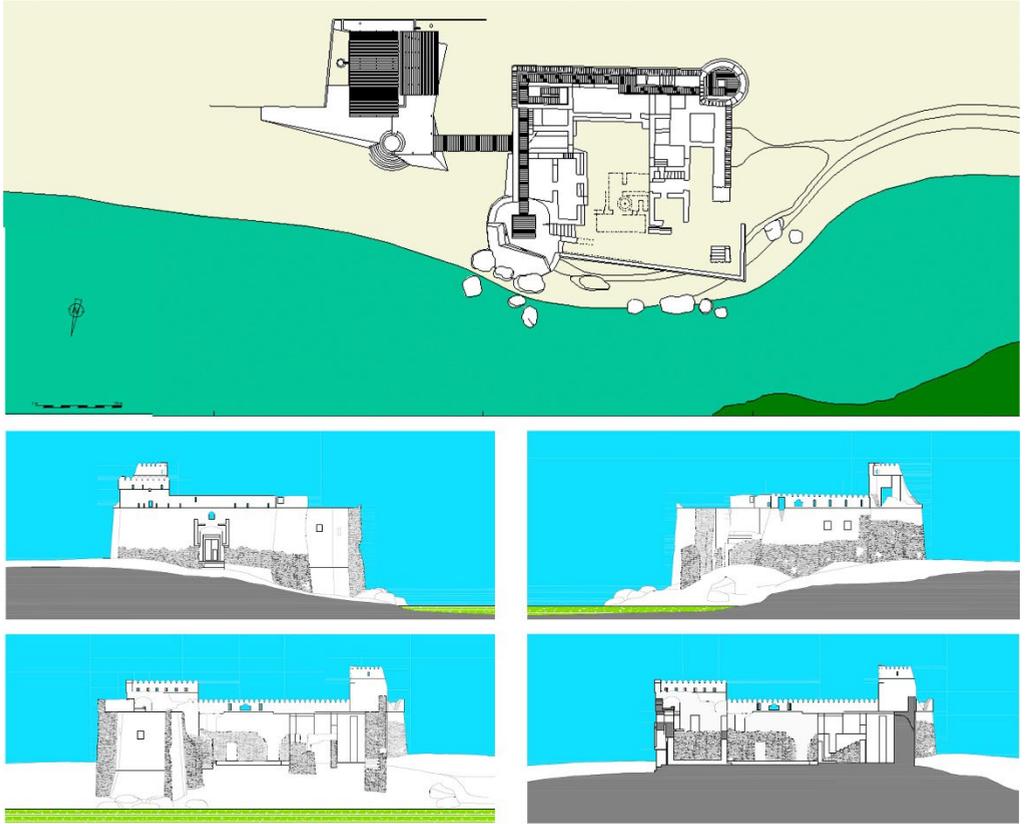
Plan of the upper level, with the proposal of the new building for visitors (not implemented) and 3 Elevations and 1 Cross Section by the Entrance. (Drawings by the Author)
